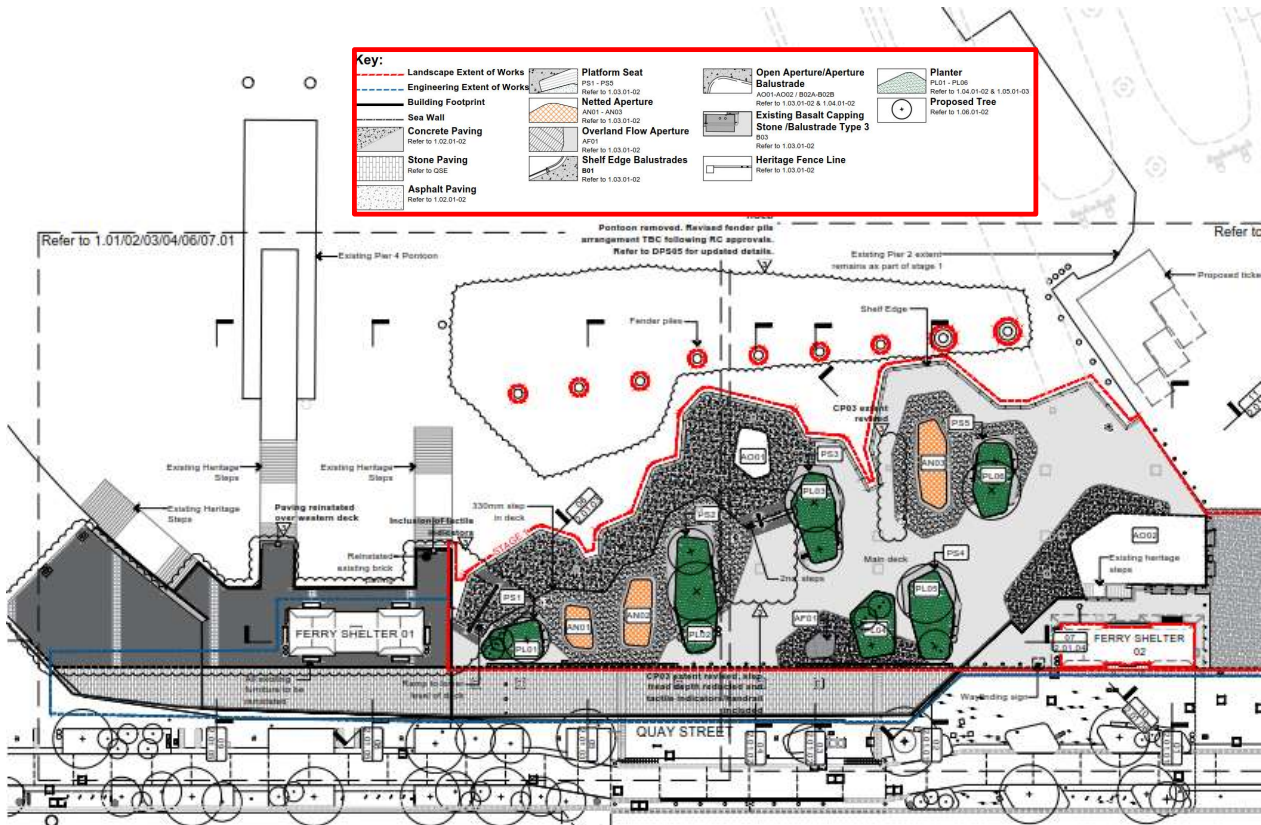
Te Wānanga Plan (Layout courtesy of Isthmus Group Ltd)
